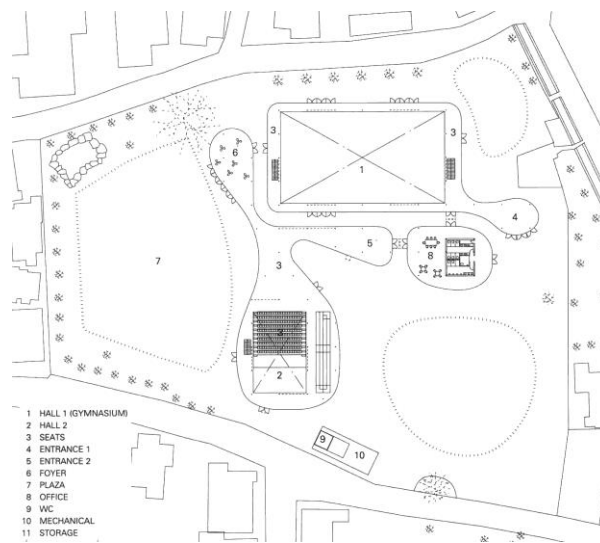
Site plan of Onishi multiple hall (Source: Yukio, F. (ed.) (2007), p282)
